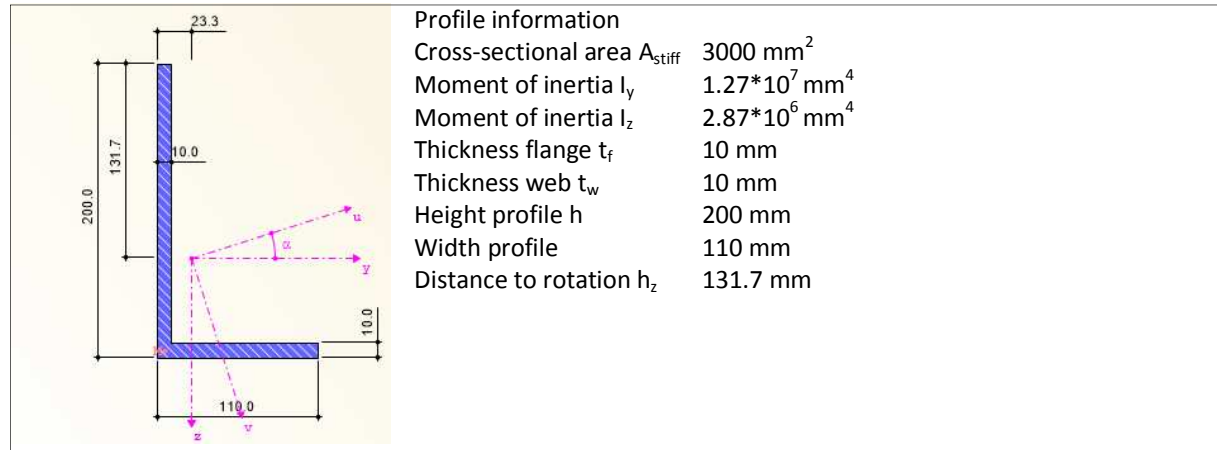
Welded steel section longitudinal stiffener, steel grade S235 and dimensions in mm
